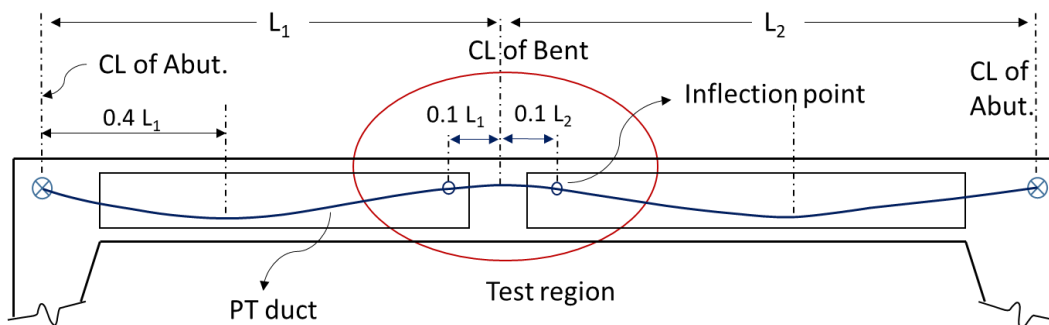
Longitudinal section through girder showing PT tendon profile
